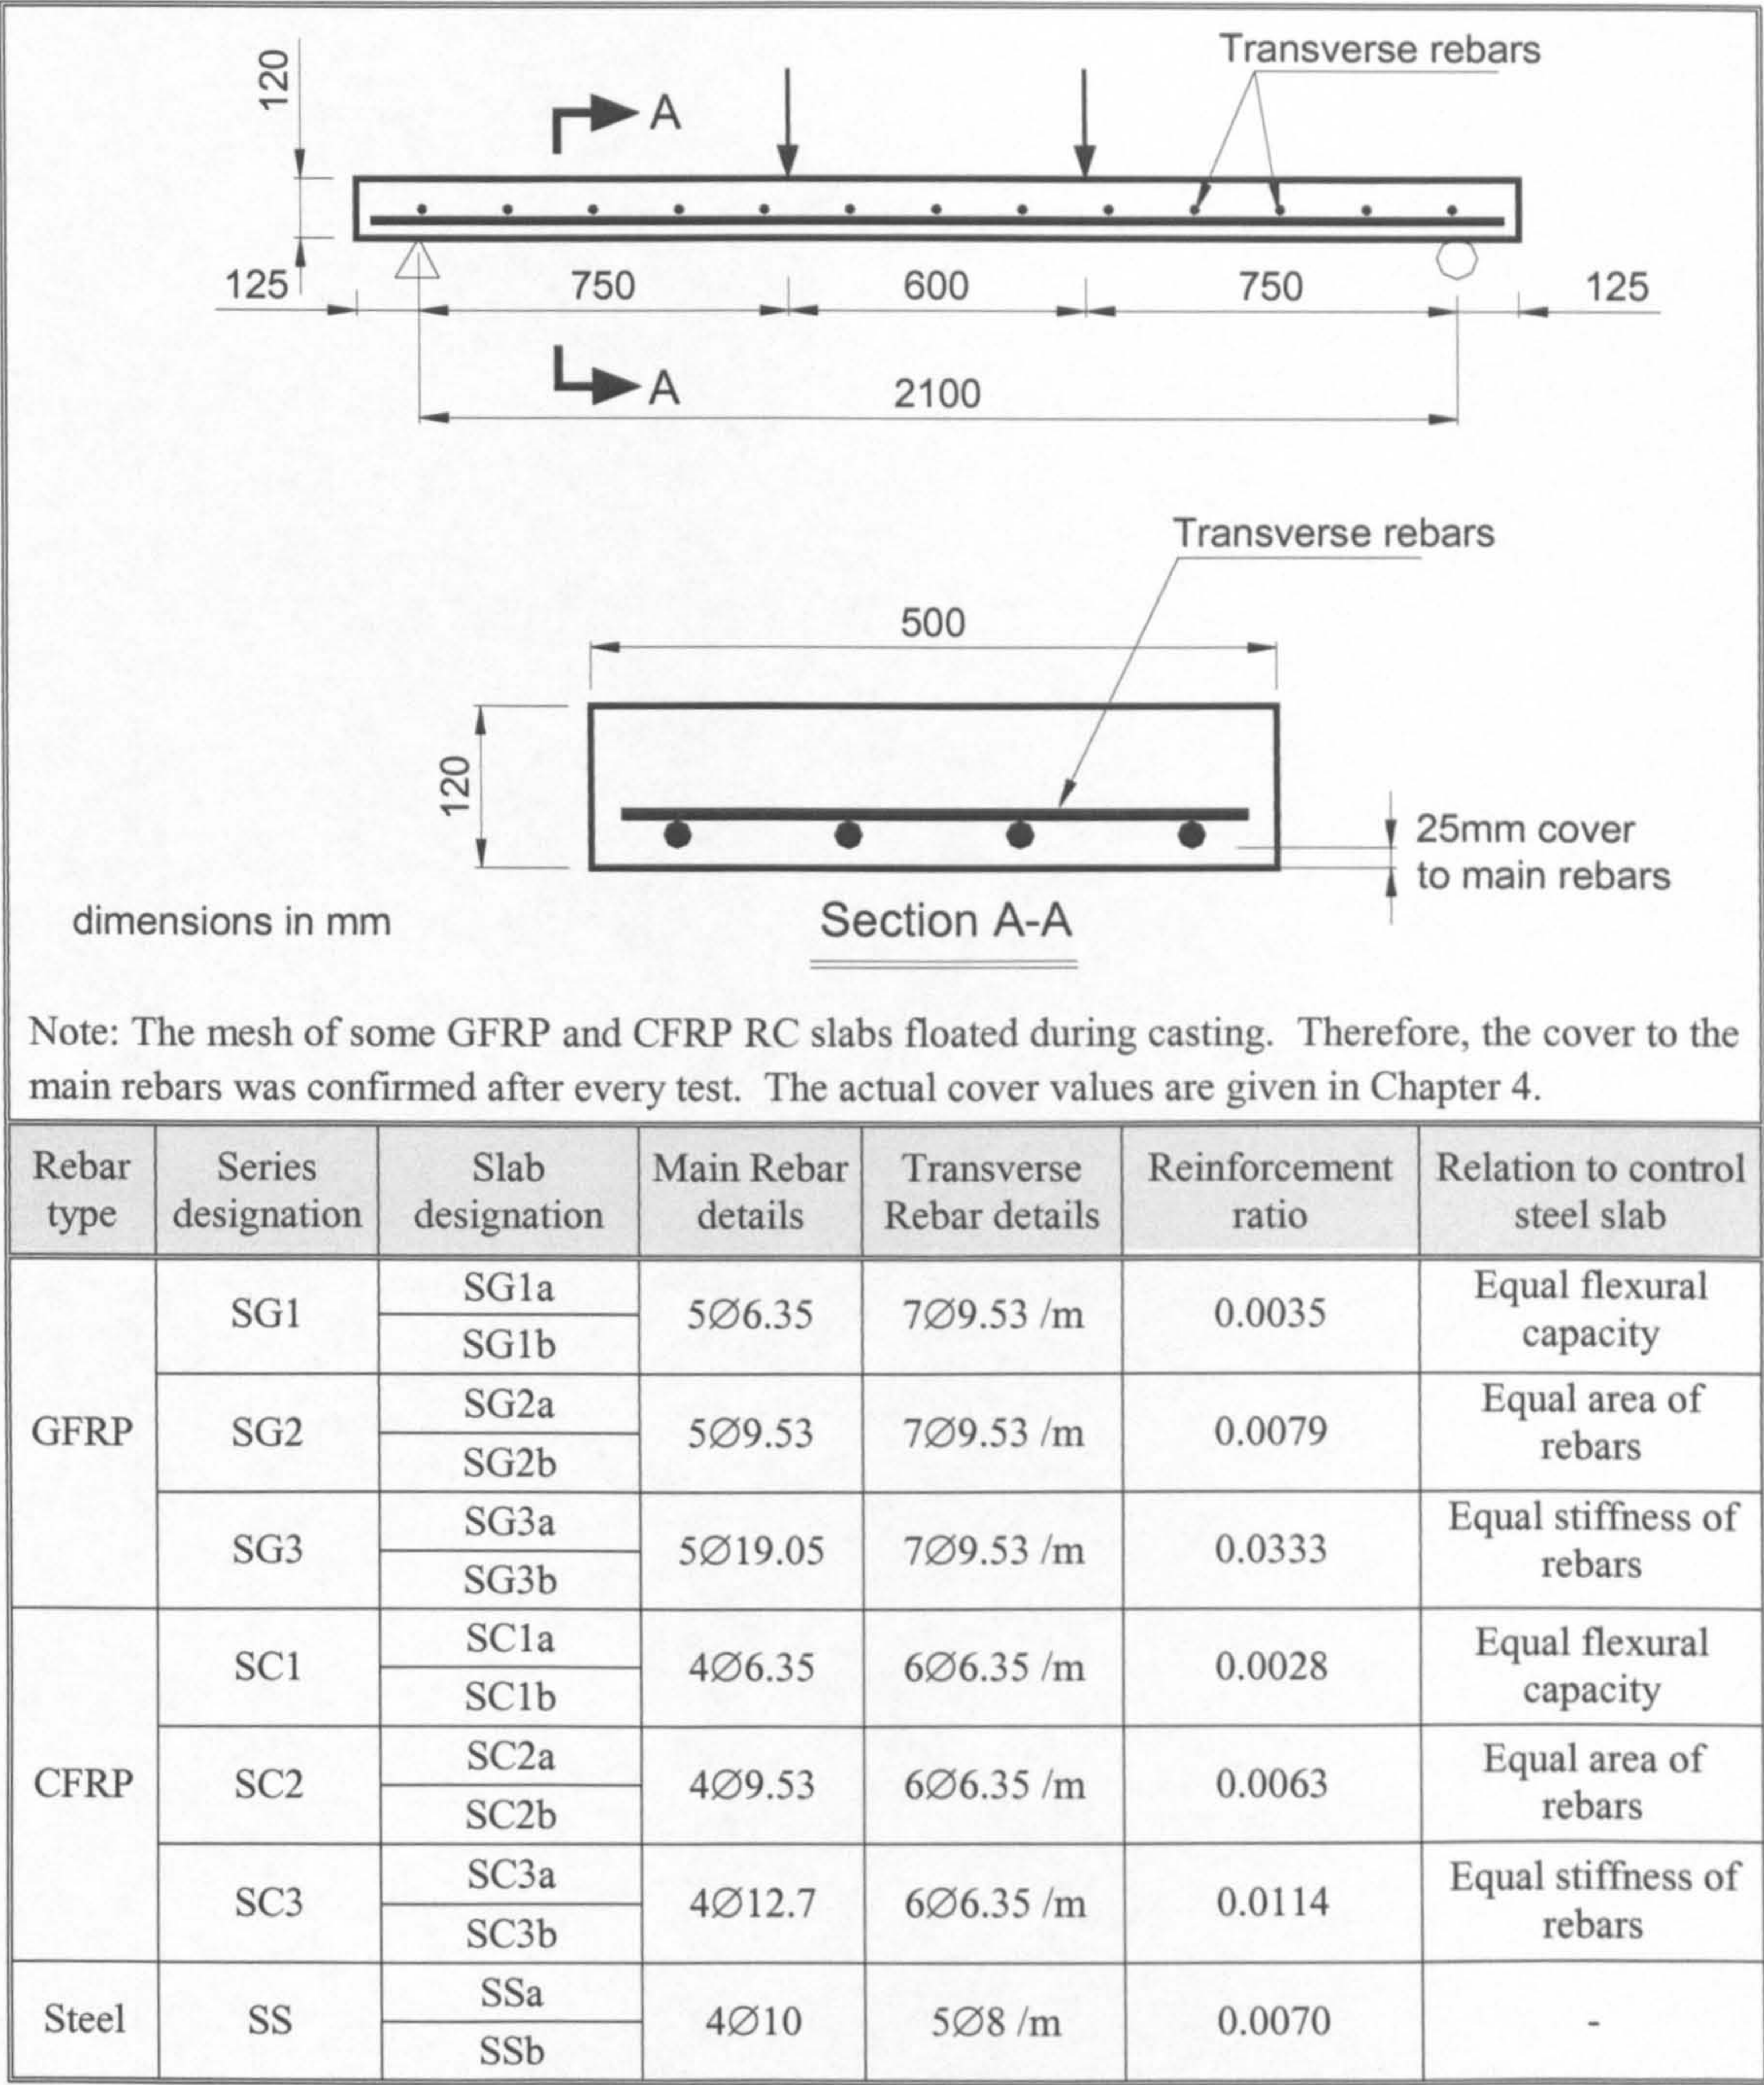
Layout, and geometric and reinforcement details of the slabs.
